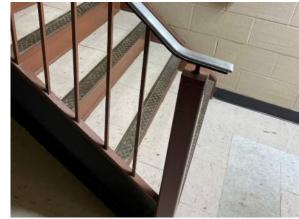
Typical stair with guardrail/handrail not complying with current dimensional requirements.
